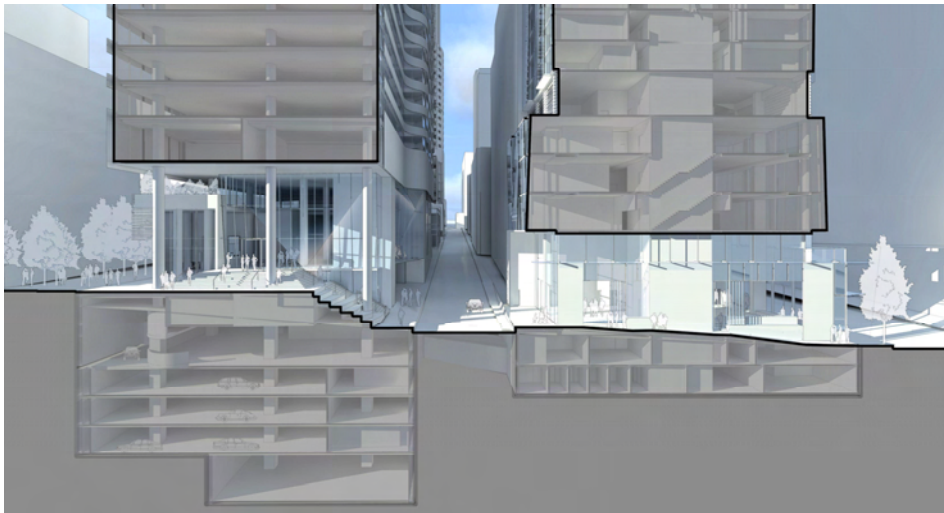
New pedestrian link connecting Walker Street and Denison Street
